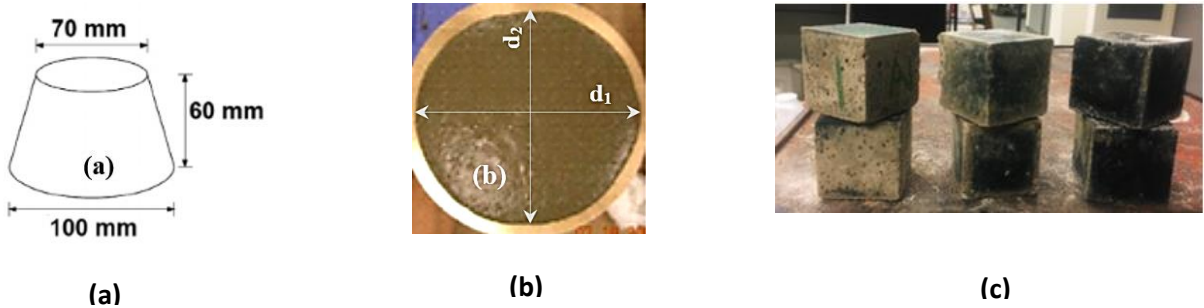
(a) Geometry of a typical mini-slump cone (b) Typical mini-slump spread (c) AASCM cubic specimens
